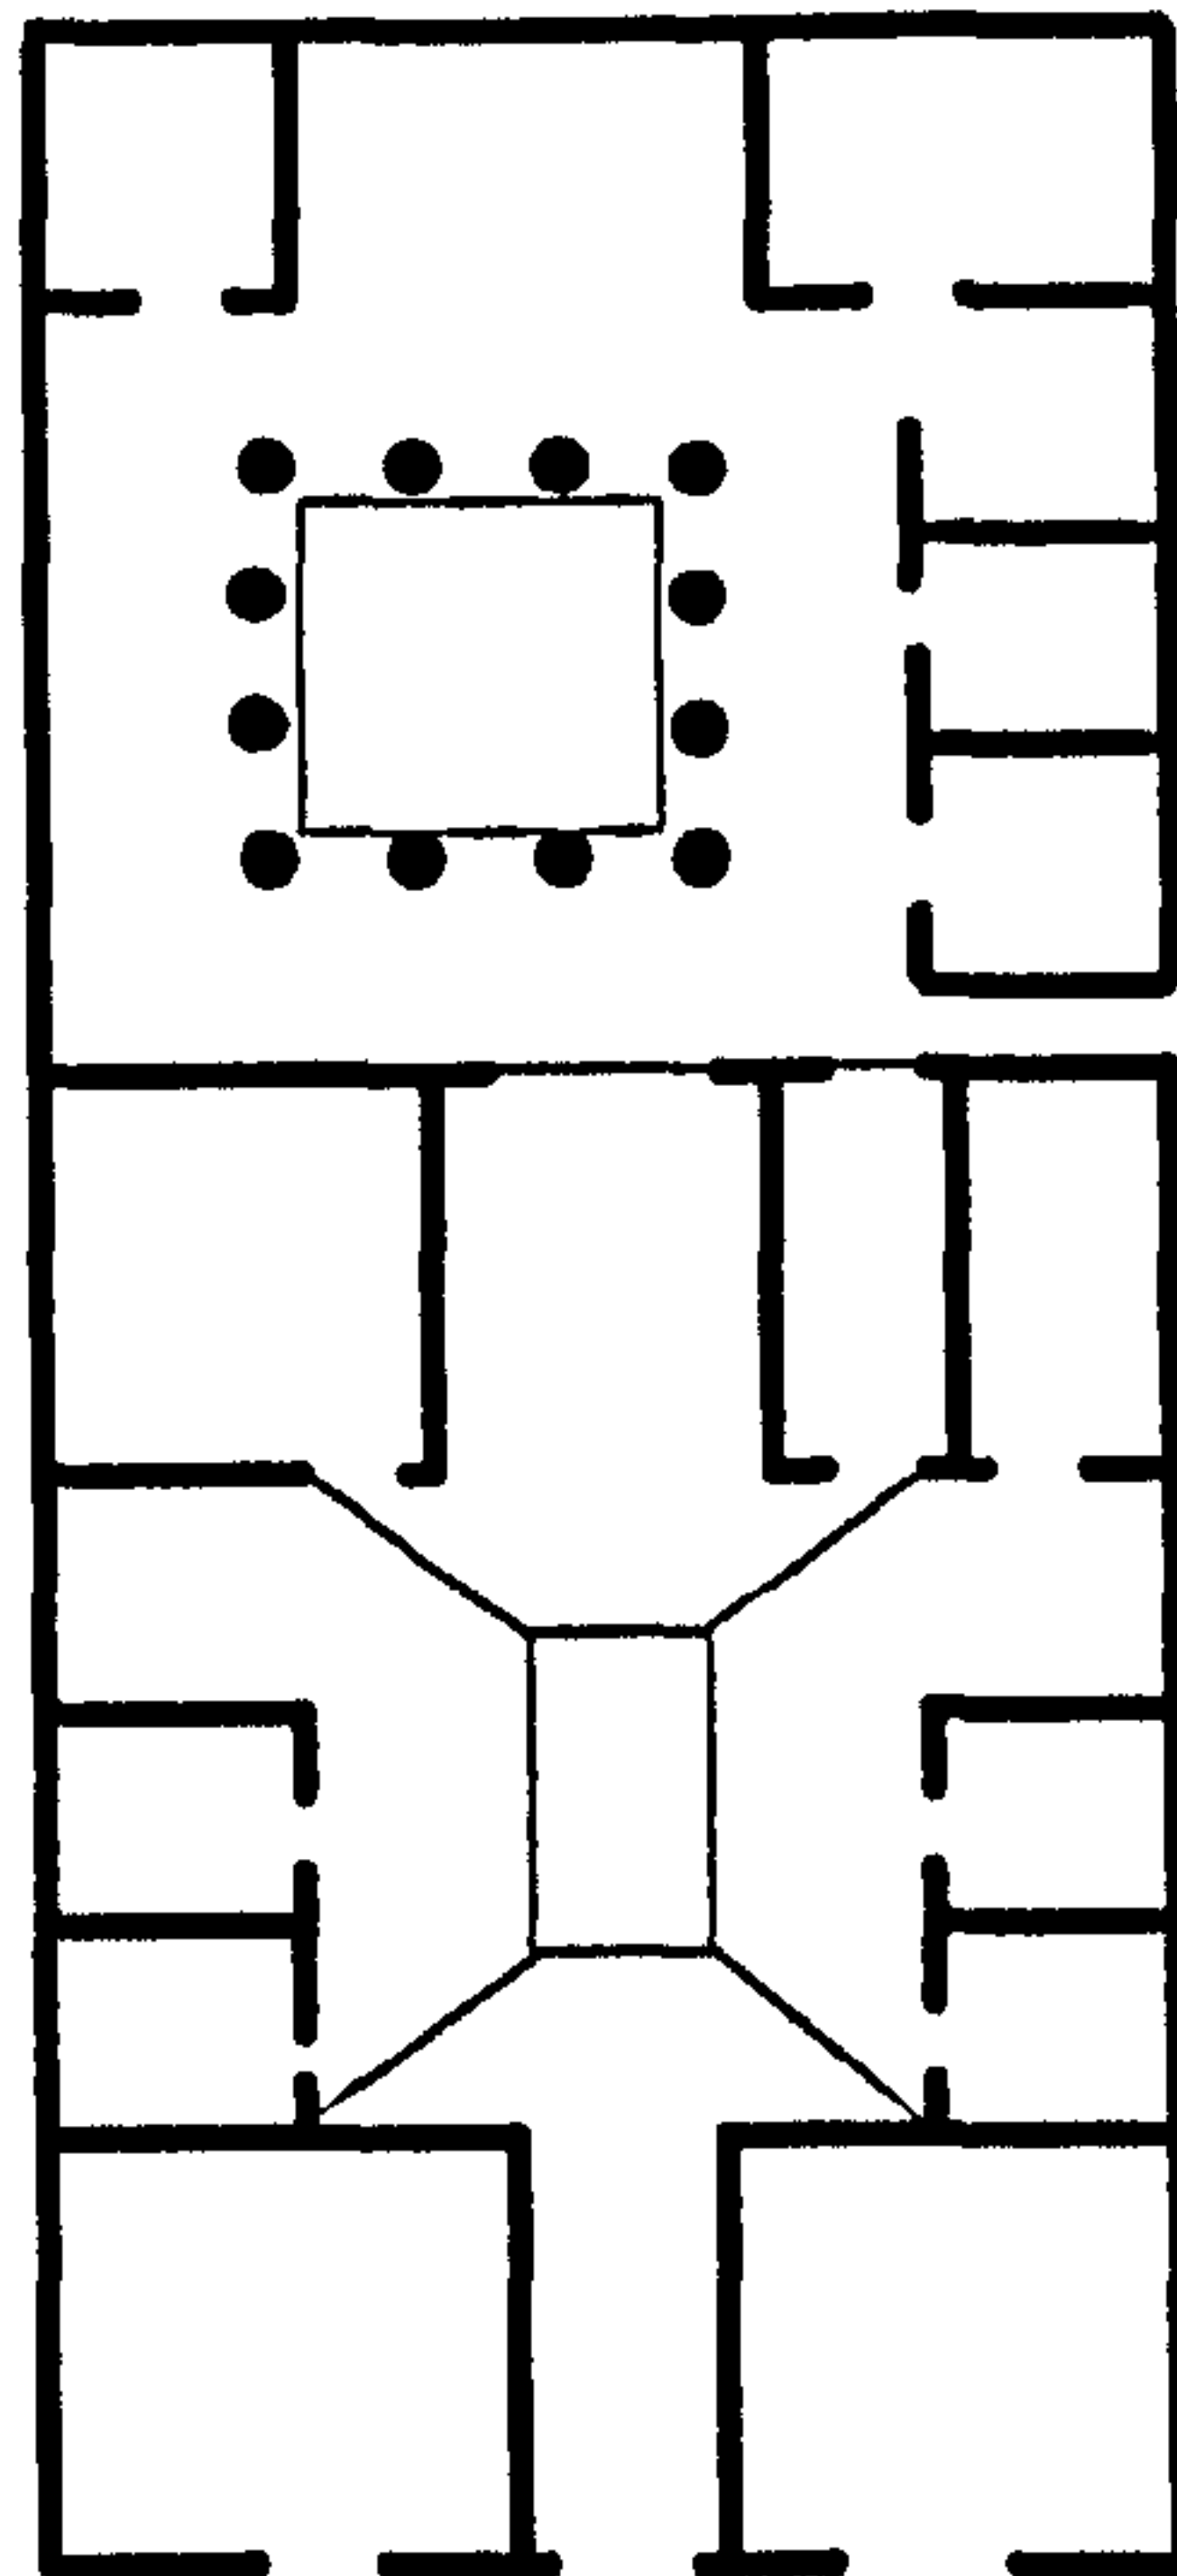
Vitruvian plan of a typical Roman house (Adapted from Morgan 1960: 178)
